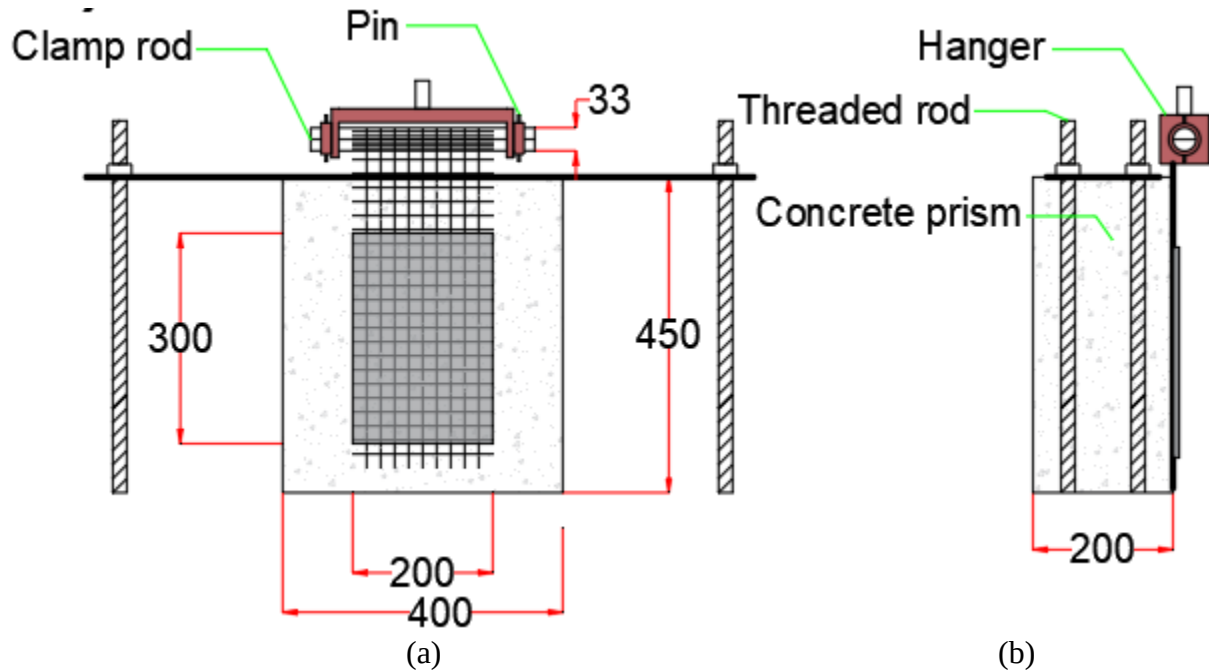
Front view schematic (a) and side view schematic of the gripping assembly (b)
